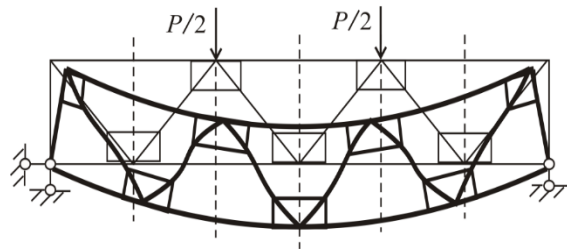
The geometry of studied truss with gusset plates in nodes when loaded
